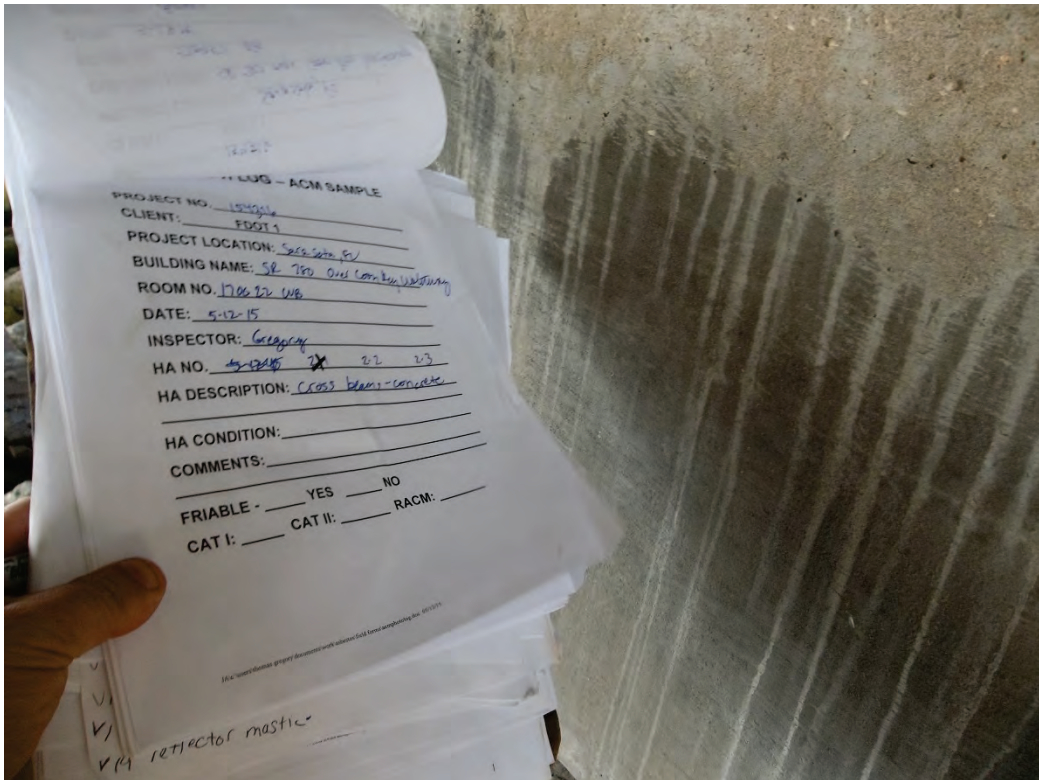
5/12/15 – SAMPLE 2.2 – HA 2
